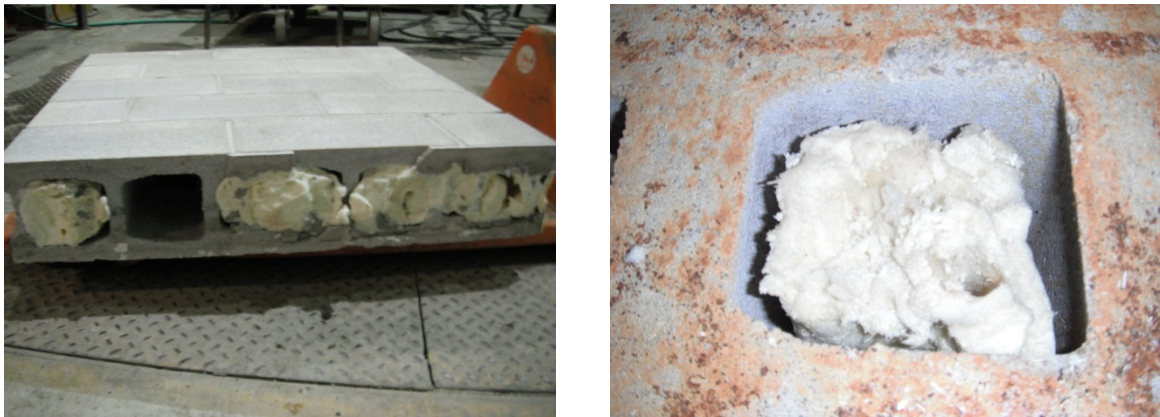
Inside of Failure Plane of B-1 2.2m Wall
